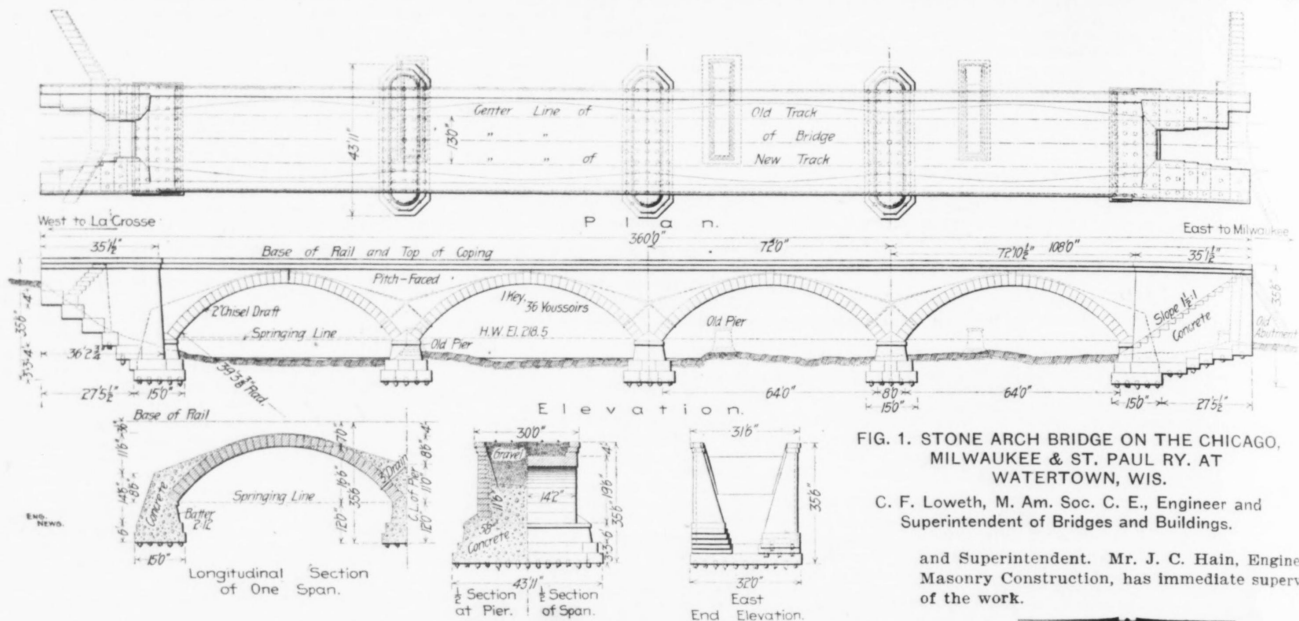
STONE ARCH BRIDGE ON THE CHICAGO, MILWAUKEE & ST. PAUL RY. AT WATERTOWN, WIS.
